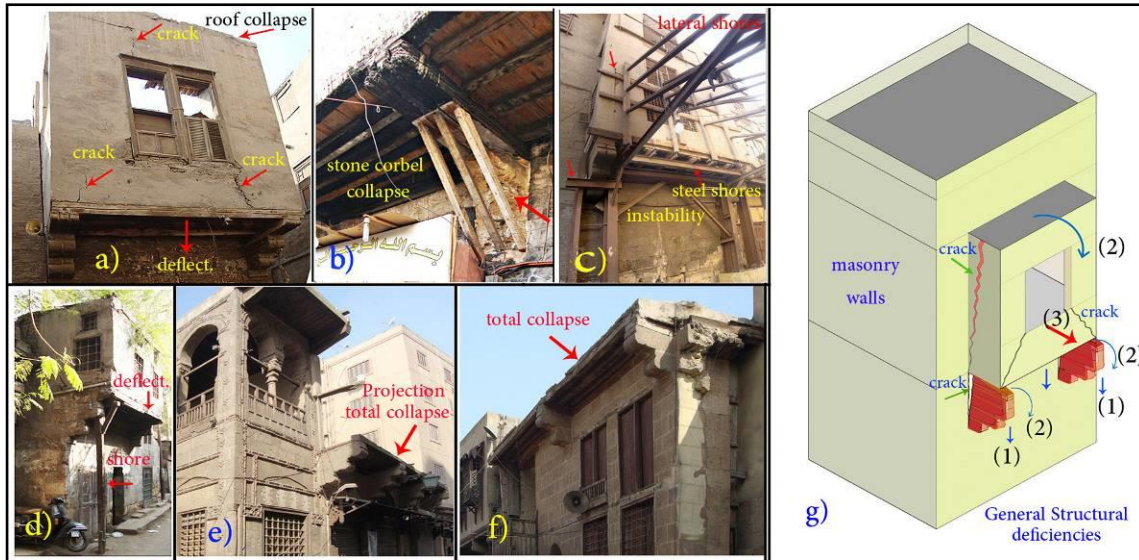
Main structural deficiencies and failures of façade masonry projections at historical medieval Cairo: a); b) "waqf Radwan Bay" 1650A.D.; c) "wekalet Oddah Pasha" 1673A.D.; d) "qubet Ali-Najm" 17th Century A.D.; e) "sabil-kuttab Qi-tass" 1630A.D.; f) "Kahla" workshop complex; g) AutoCAD drawing (by the researcher) to summarize the deficiencies.
